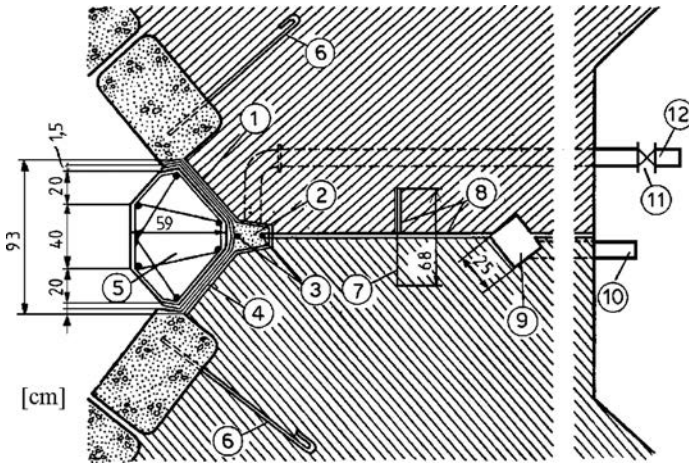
Sealing of joint for Pantano d'Avio dam, Italy. (1) Bituminous waterproofing paper in 3 layers; (2) plug of bitumen; (3) steel conductor for heating the bitumen; (4) leveling course of 1.5 cm thickness; (5) reinforced concrete prism; (6) anchor of diameter 20 mm; (7) zinc sheet, 2 mm; (8) surface coated with bitumen; (9) drainage manhole; (10) offtake pipe; (11) valve; (12) pipe for discharging of bitumen.
